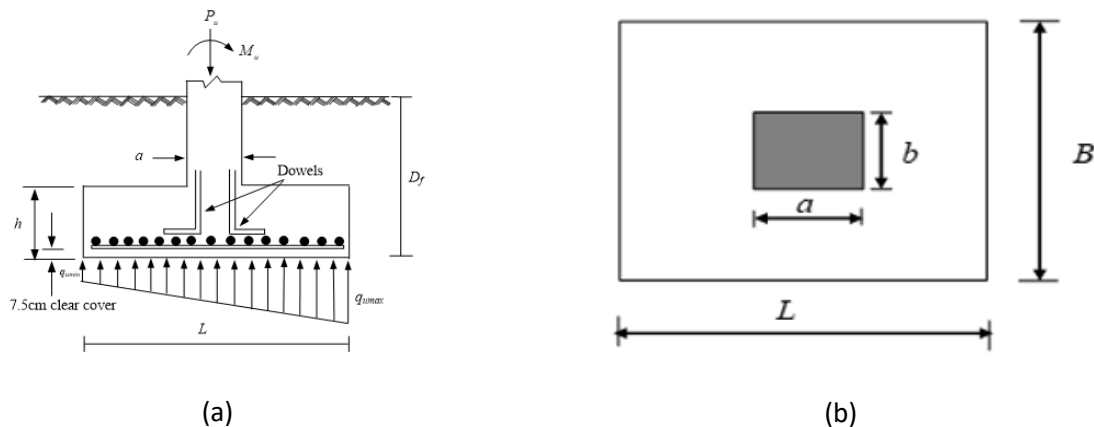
The reinforced concrete footing subjected to the concentric factored load P_u and bending moment M_u : (a) elevation and (b) plan
